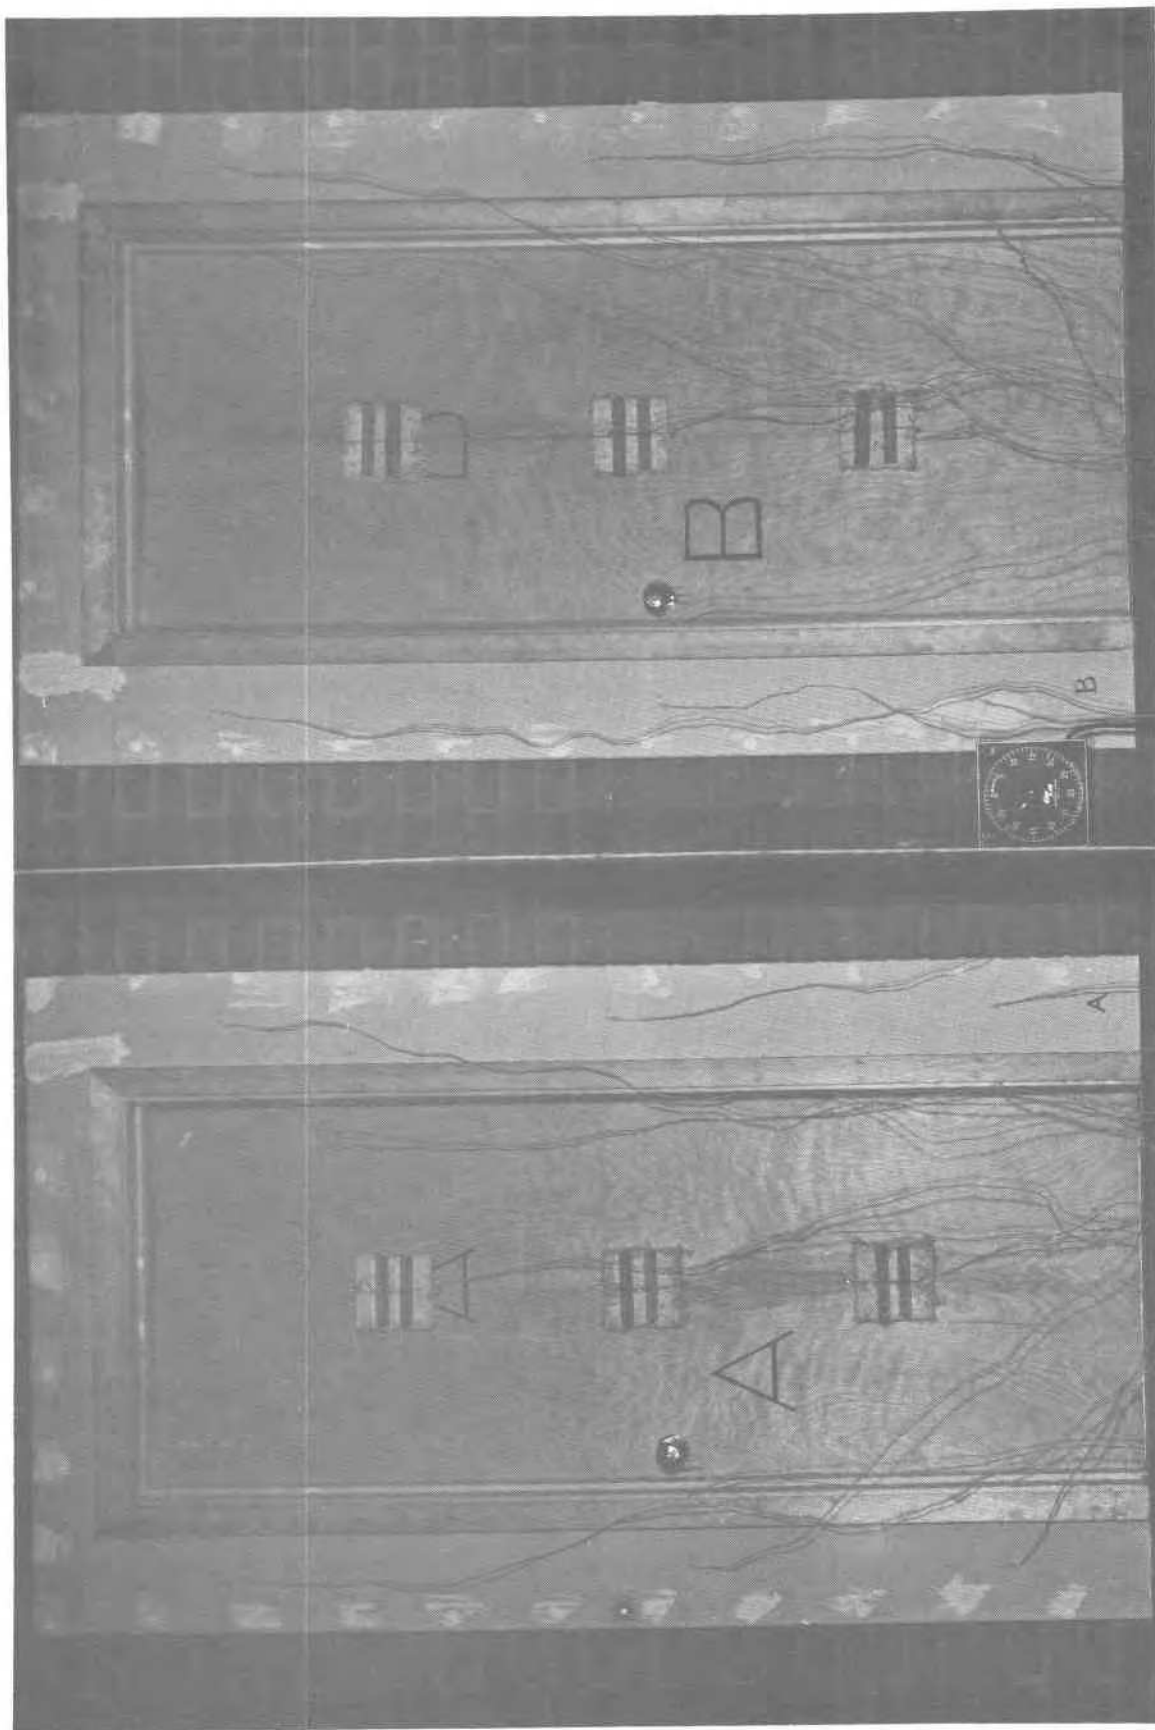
Door Test No. 1. Unexposed face at 4 min.
